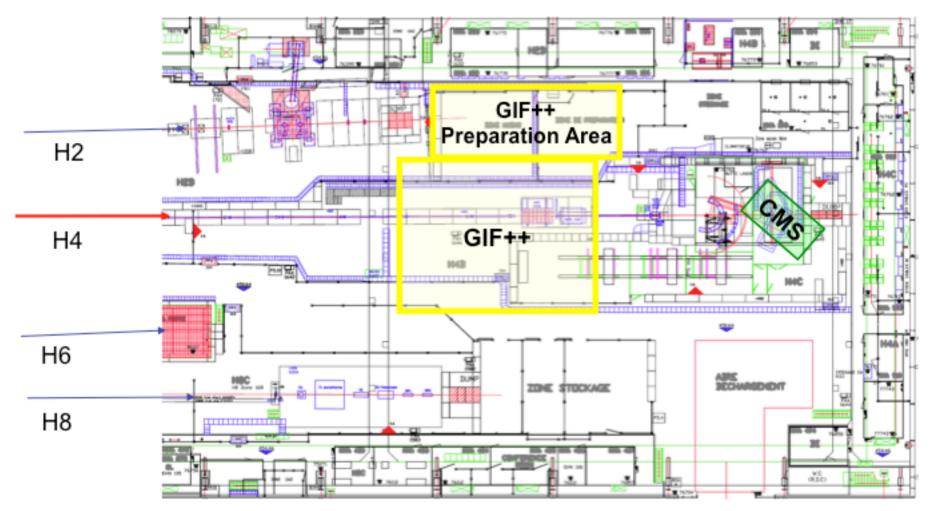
Floor plan of part of the H4 beam line in the EHN1 (CERN Building 887). GIF++ is located at the end of the beam line, downstream the CMS ECAL beam test area. About 100m upstream the GIF++ bunker, the following test areas are currently in operation: Compass-Calo, CALET, INSURAD, CMS-ECAL, CMS-BCM, NA63, RD51, LHCf, SiTRD.
